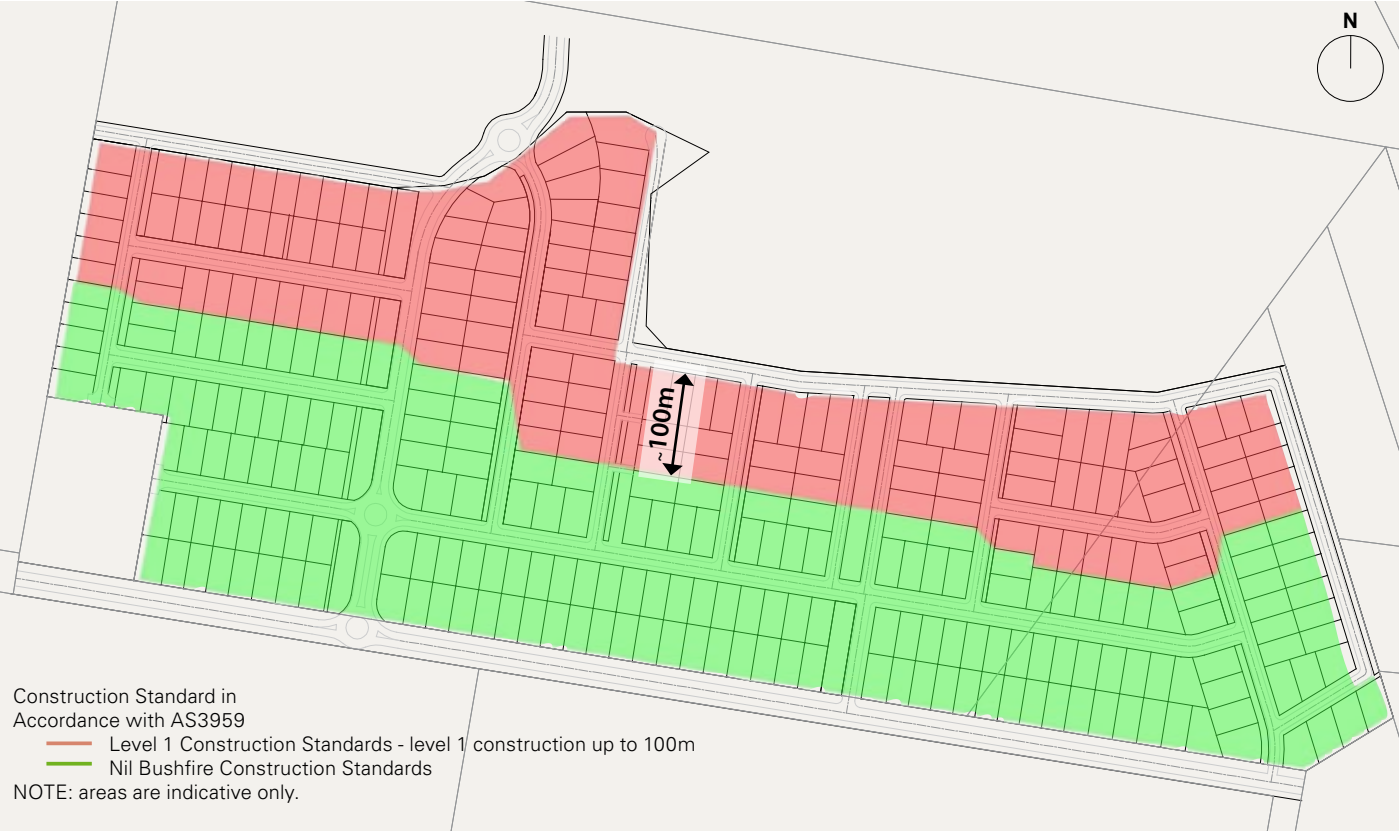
CONSTRUCTION STANDARDS FOR DWELLINGS ON SUBJECT SITE
